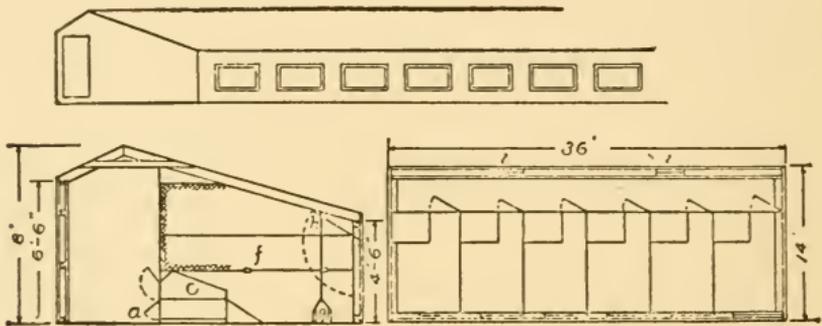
PLAN OF SIMPLE BROODER HOUSE
